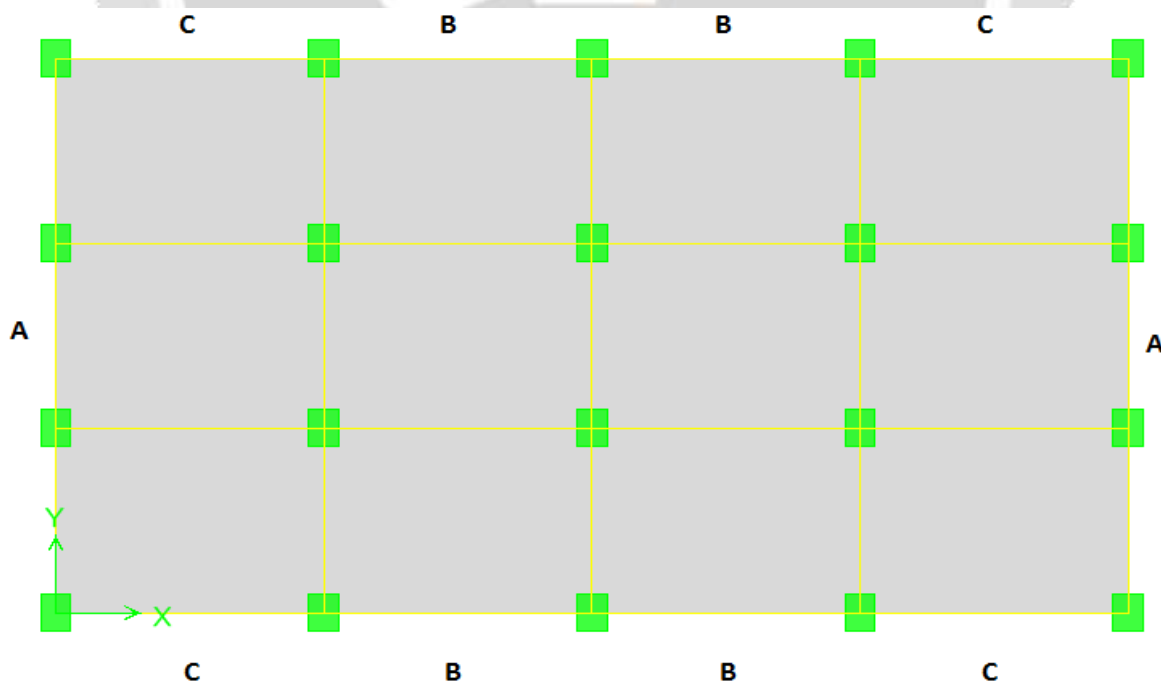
Plan of Model Showing Various Locations where shear wall and bracing is placed.
